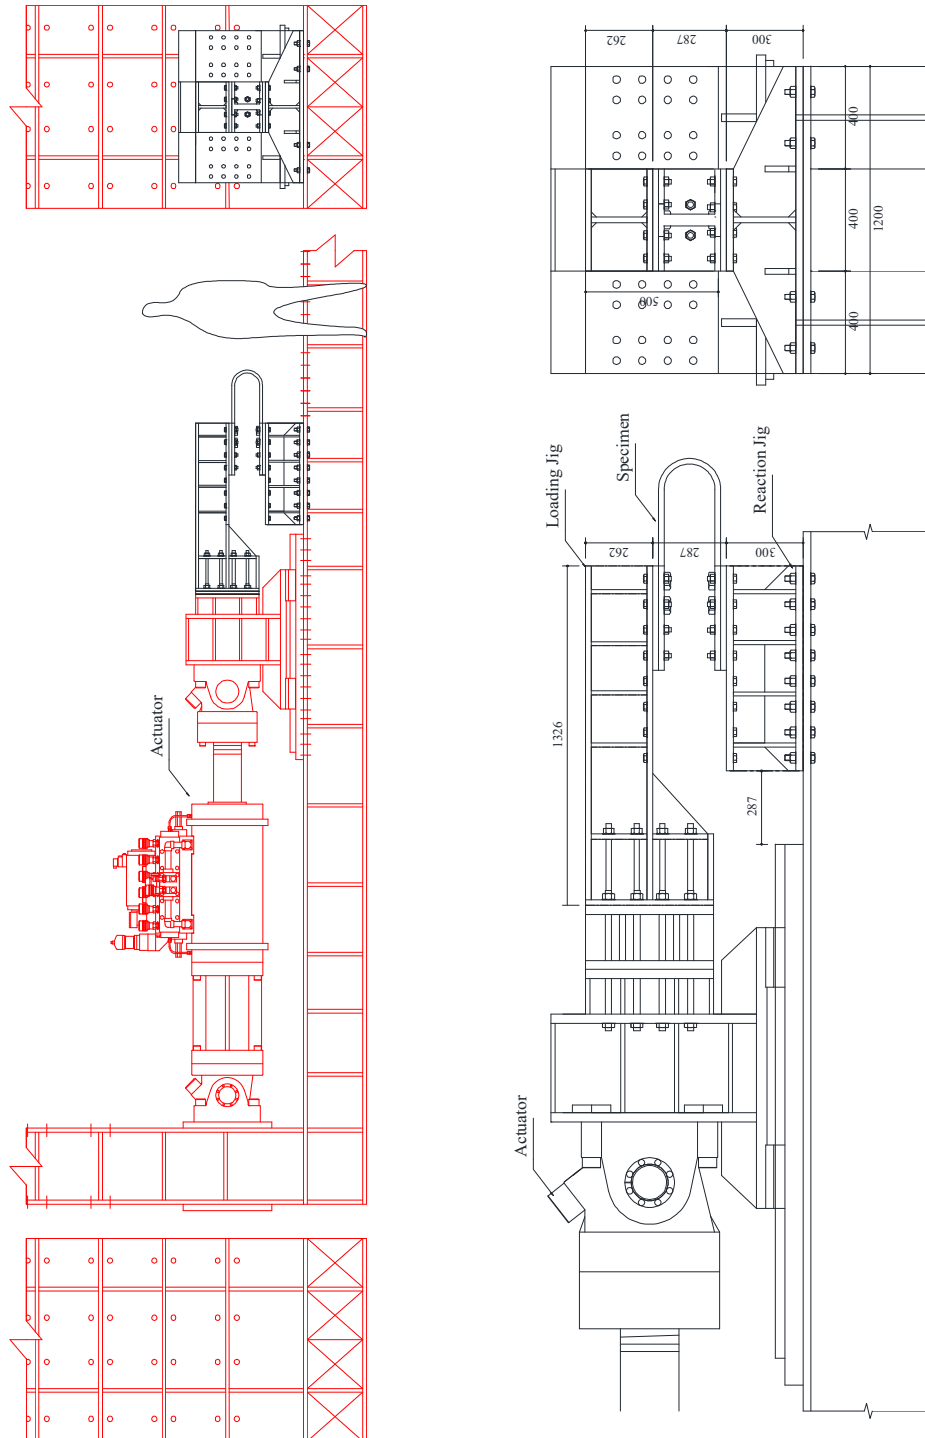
Loading equipment (unit: mm) damage evaluation
